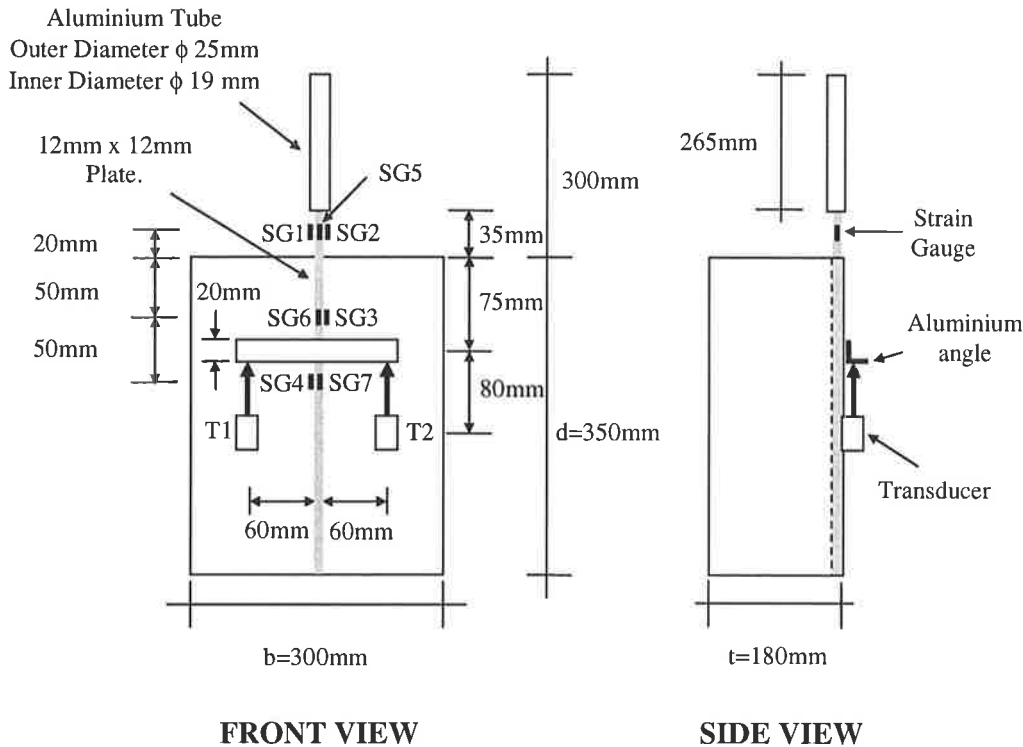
Pull test of 12mm x 12 mm CFRP plate details.
